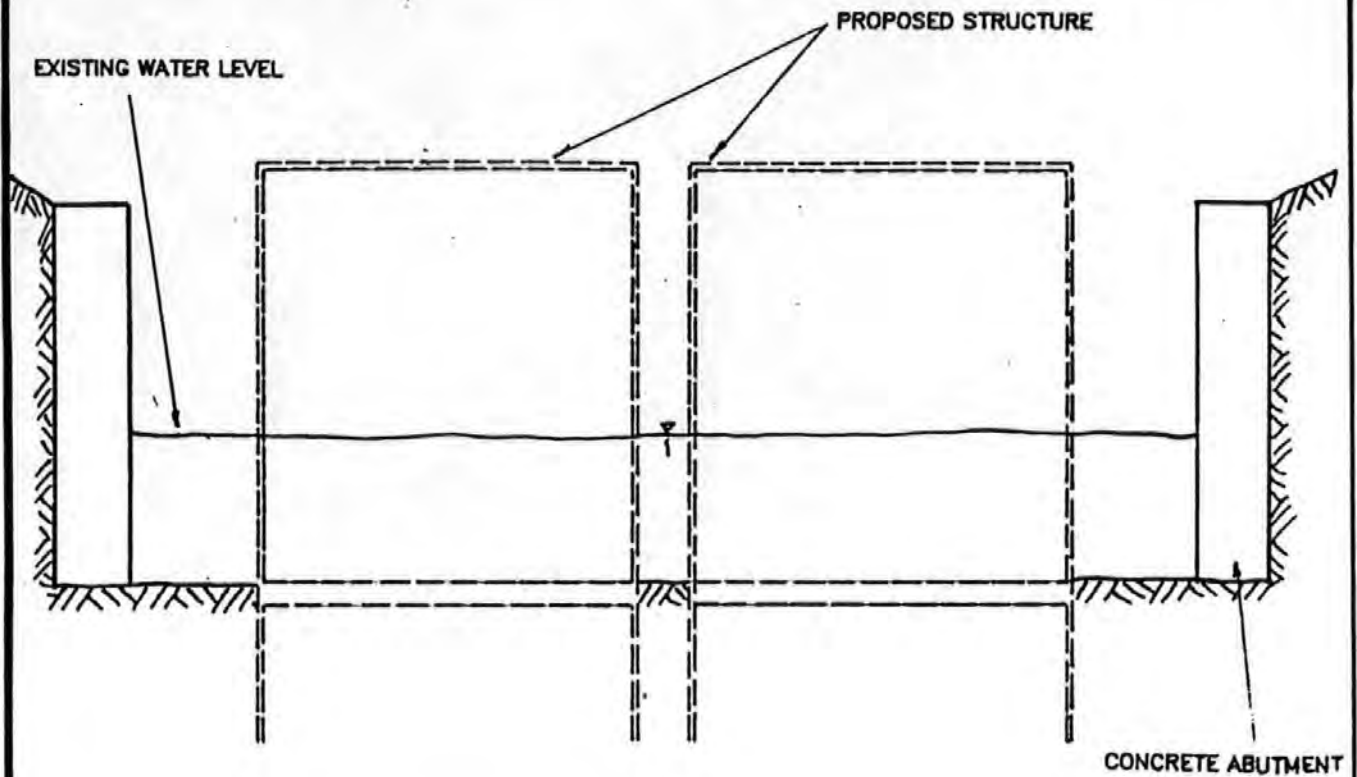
IN-SITU CONCRETE SYSTEM
